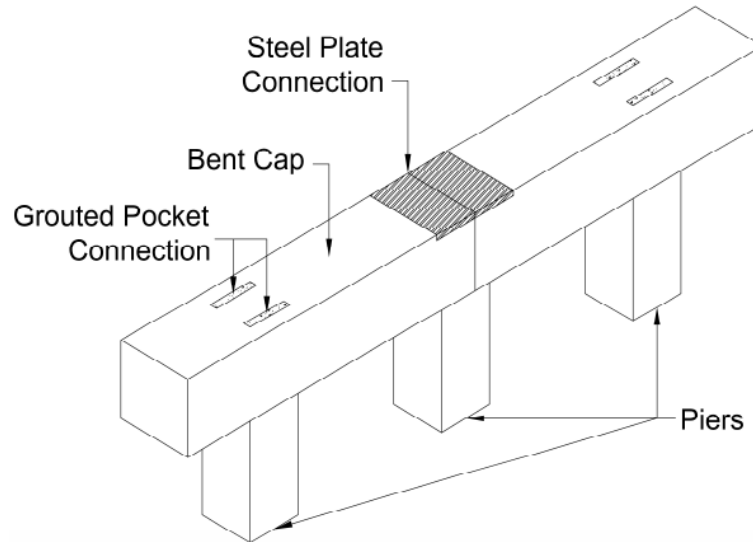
Isometric view of Welded Steel Plate Connection.* (Unlu, 2010)
